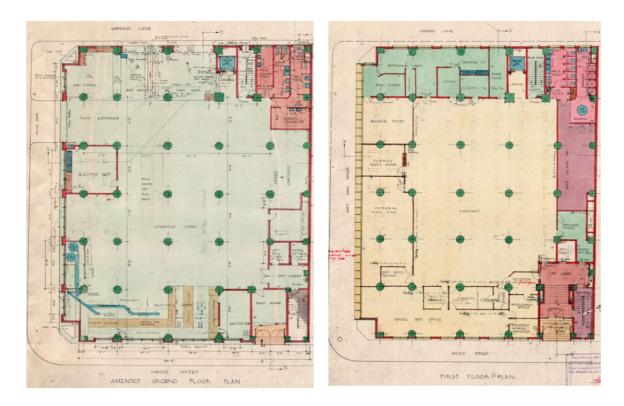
Original Ground Floor and First Floor plans, dated 1956 (post-construction).
